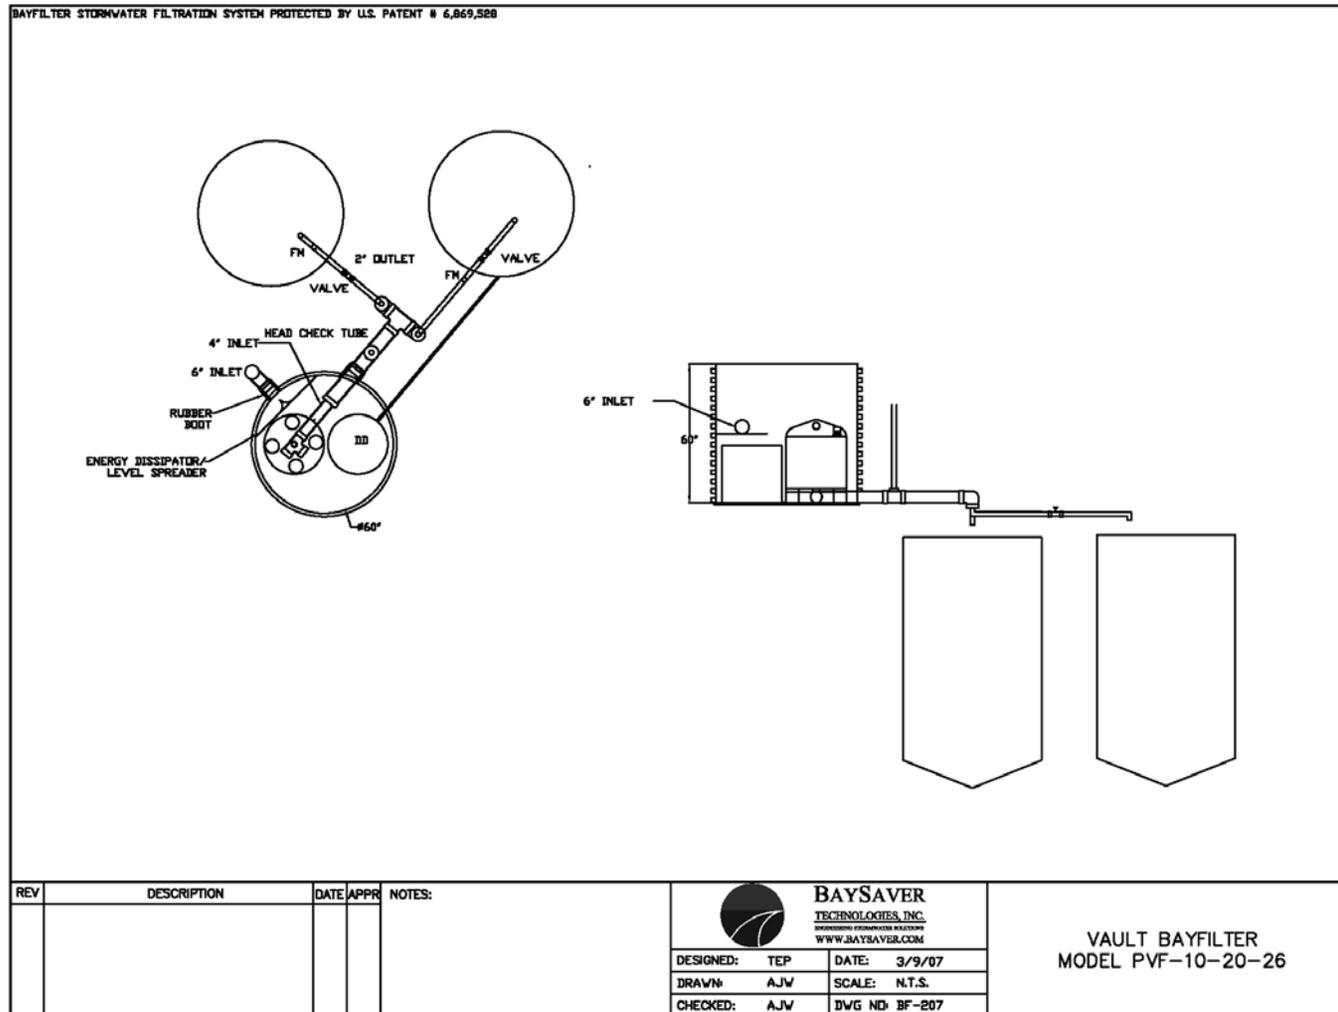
Vault Layout for Laboratory Testing of Generation #10 Filter Cartridge and Piping Connections
